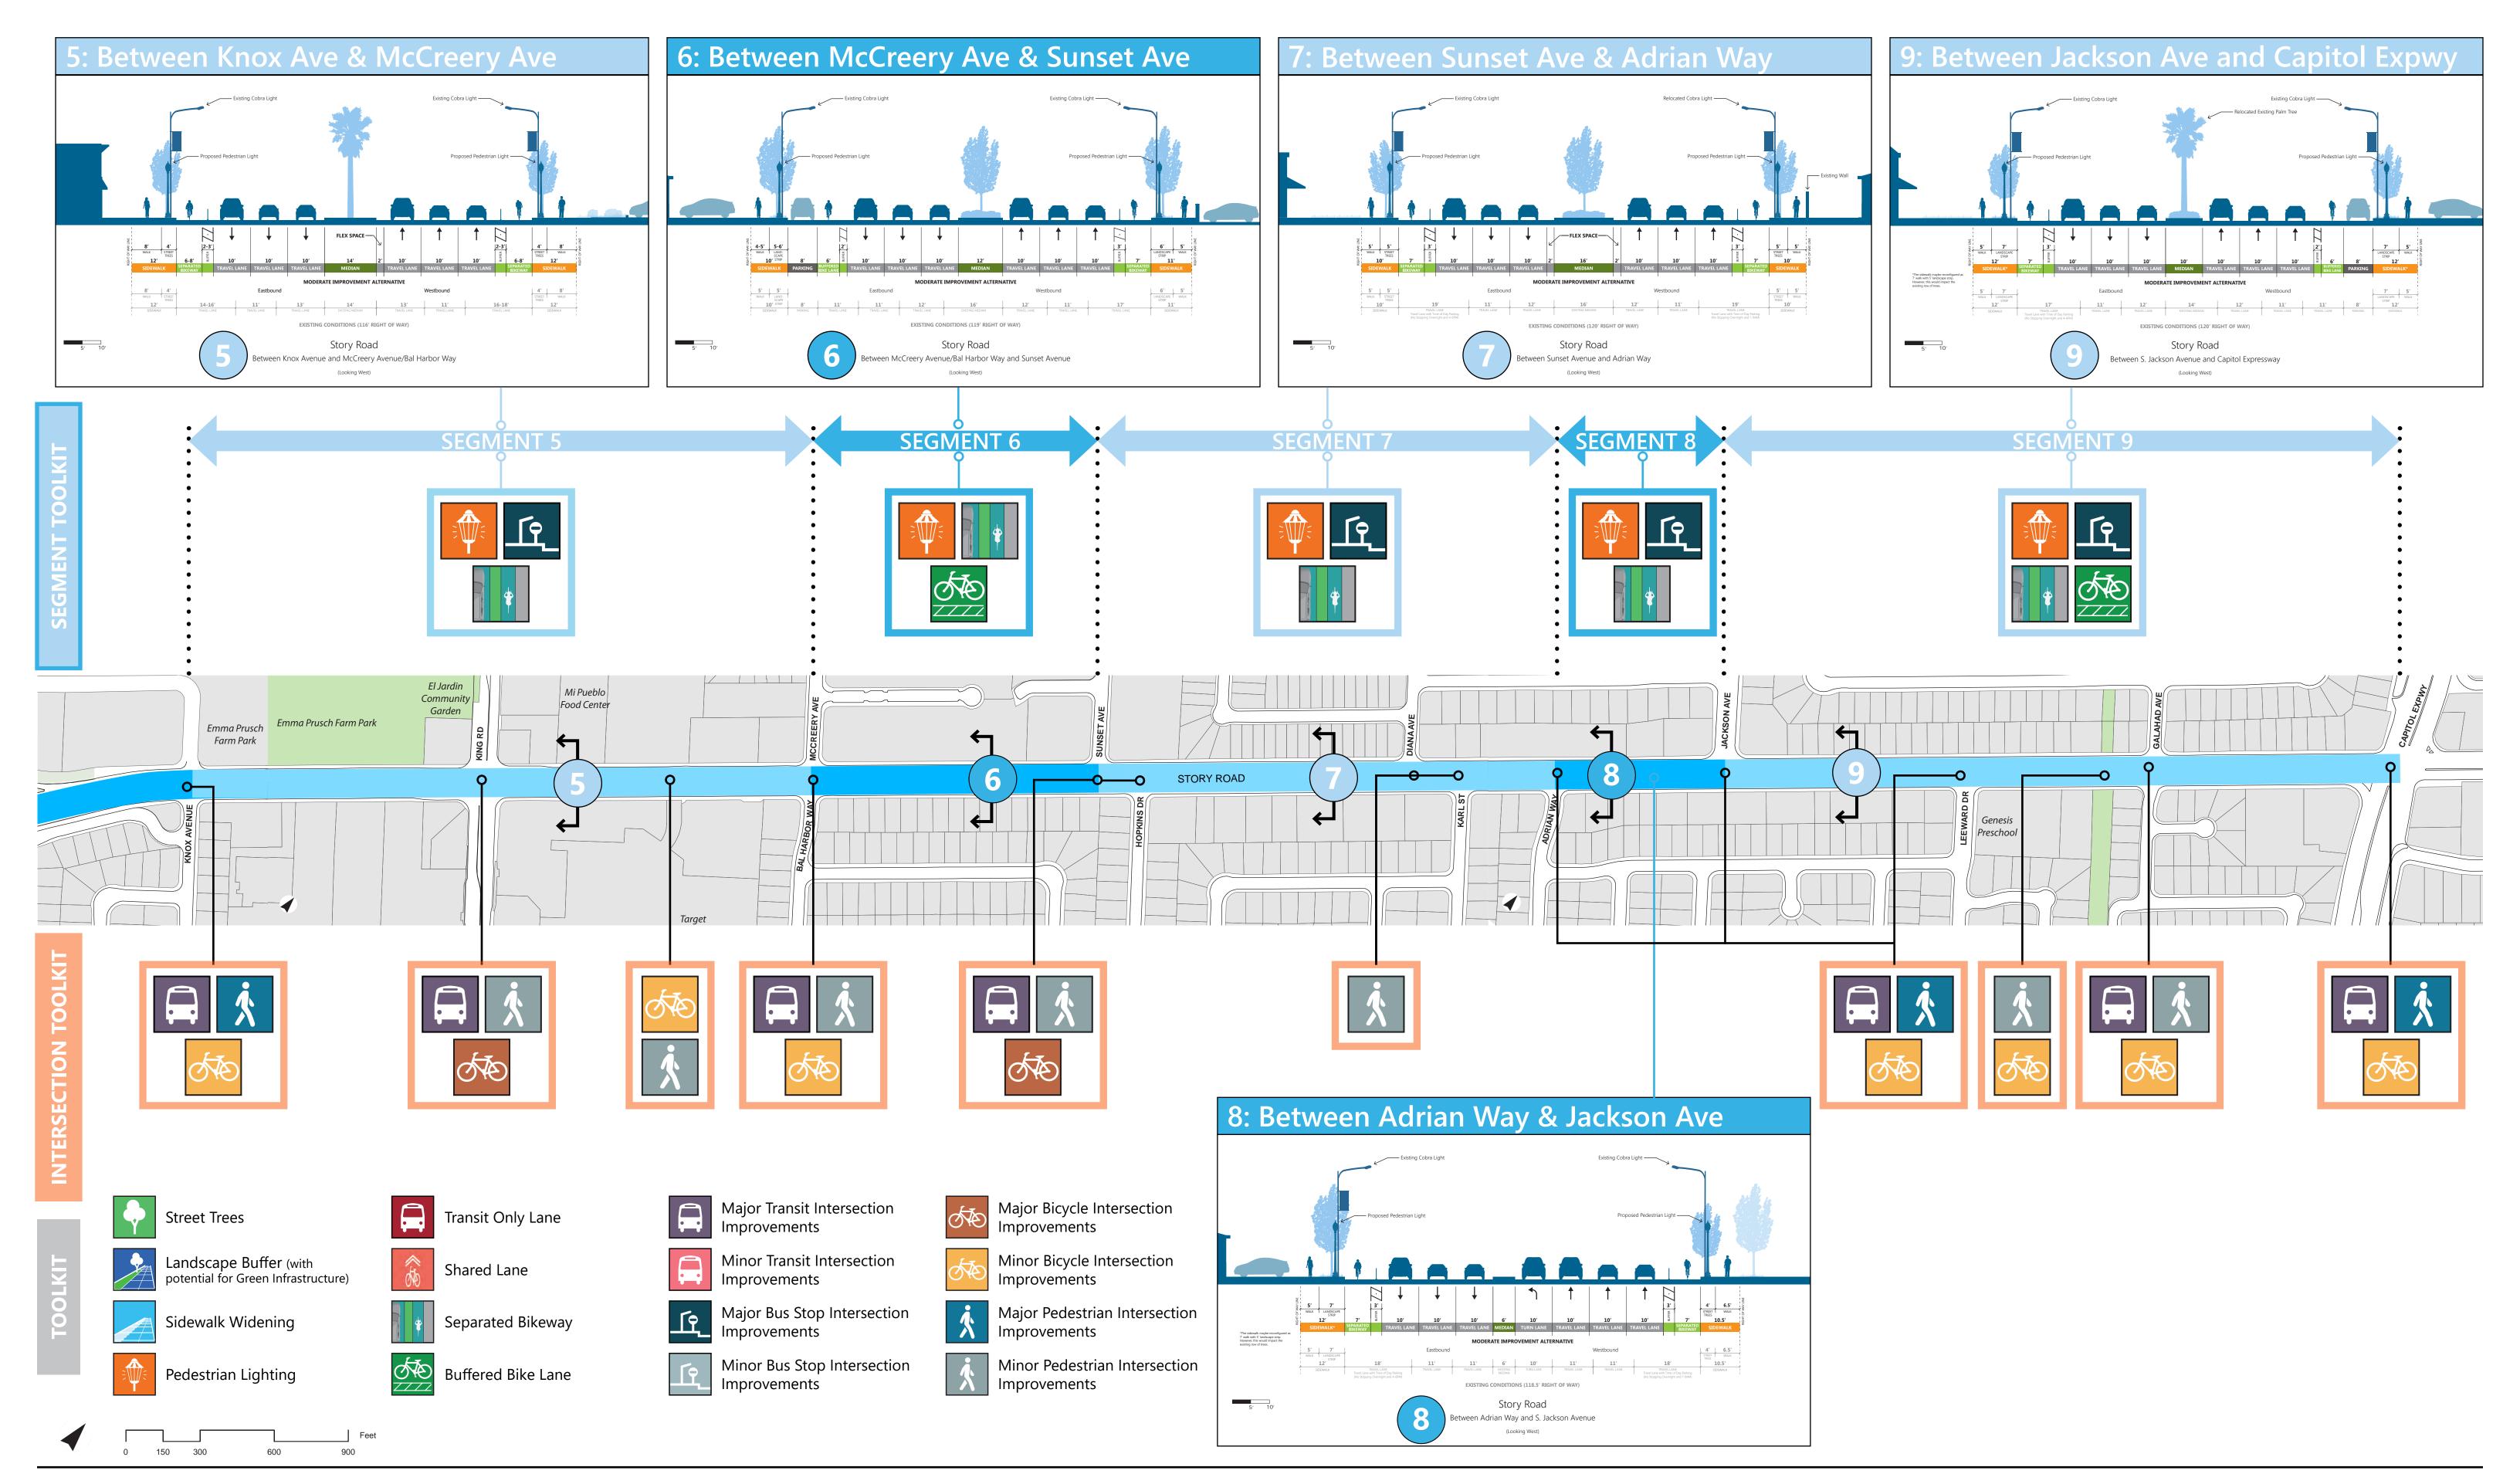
C: Story Road at Knox Avenue to Story Road at Capitol Expressway MODERATE IMPROVEMENT ALTERNATIVE
